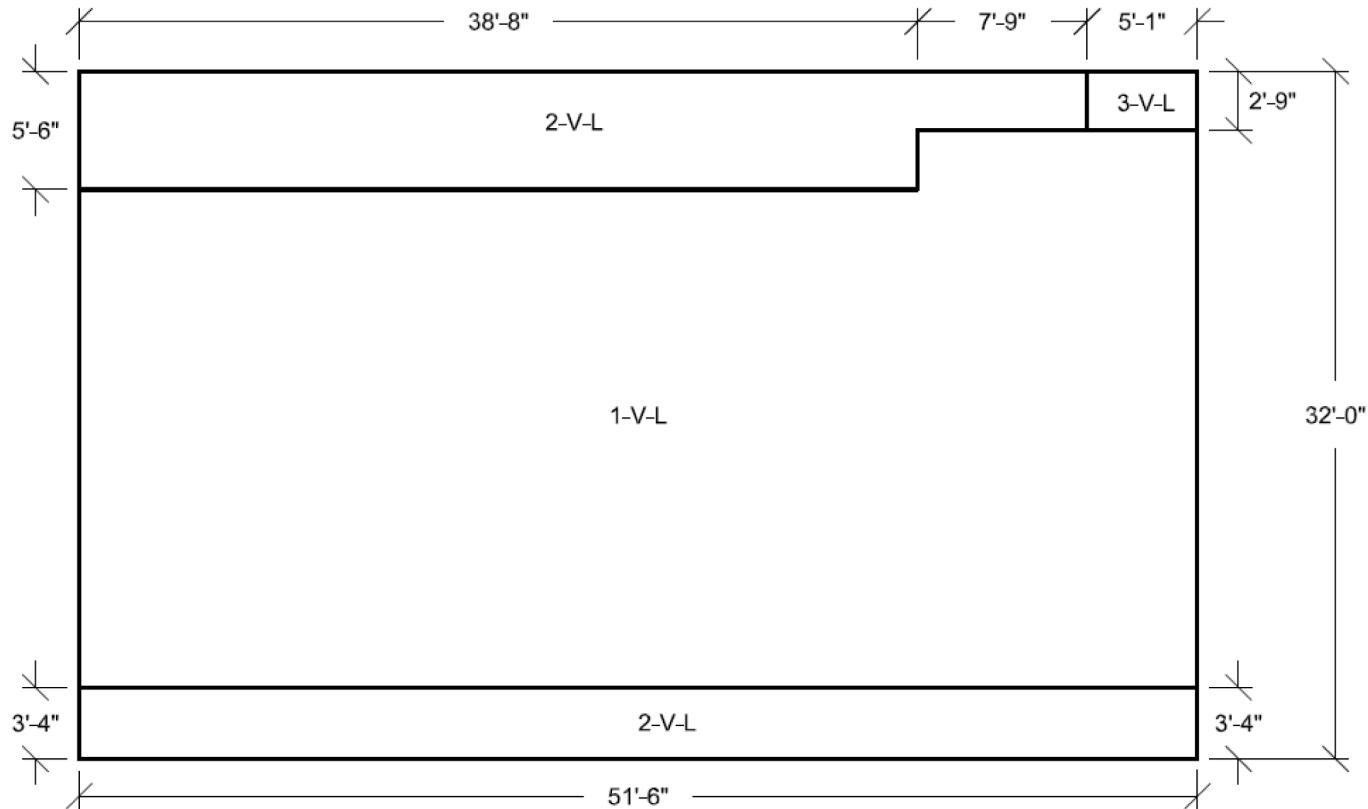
H.6-148 DGFSV Roof 2 Looking Down Vertical Reinforcement Zones Near Side Face
